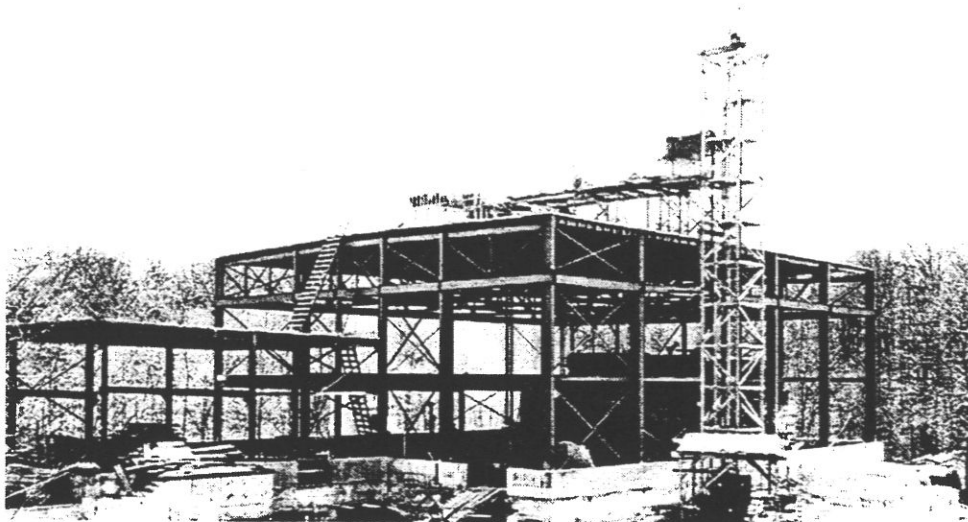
Heating and Refrigeration Plant, Building 16, looking southeast.
